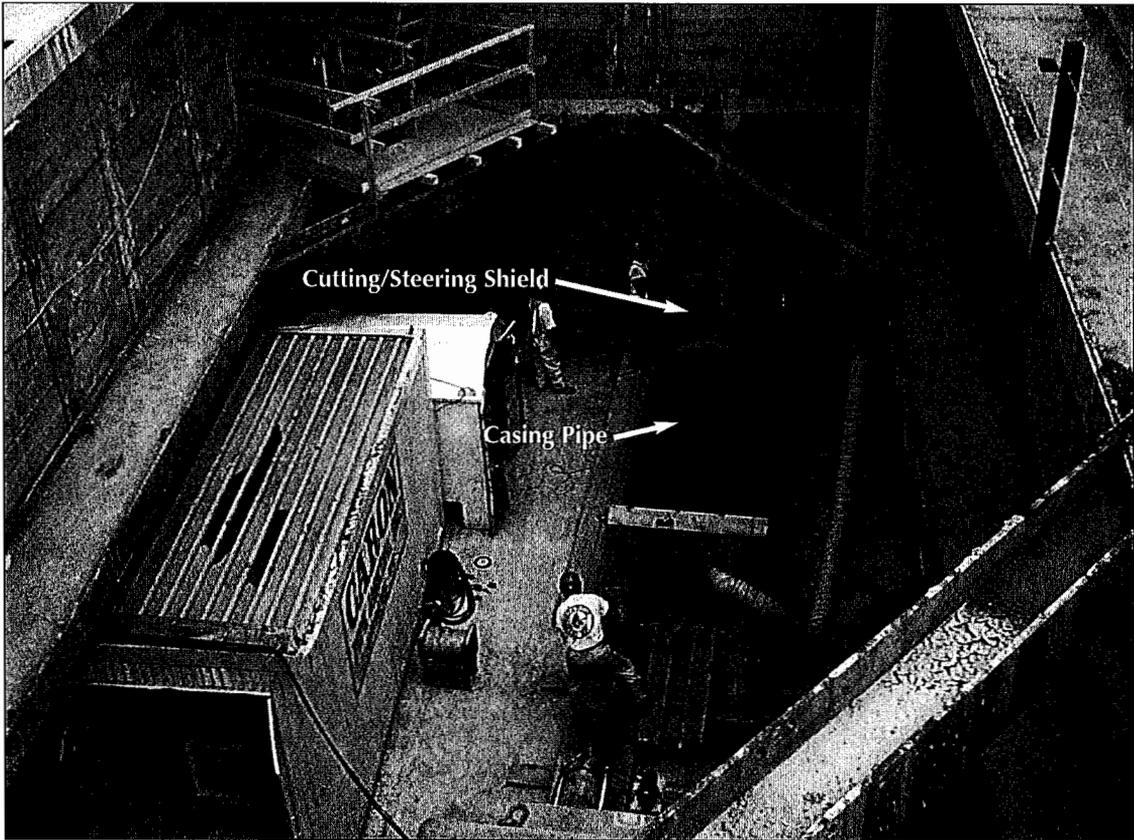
Jacking operations in the jacking pit showing the cutting shield and one pipe section being jacked.
